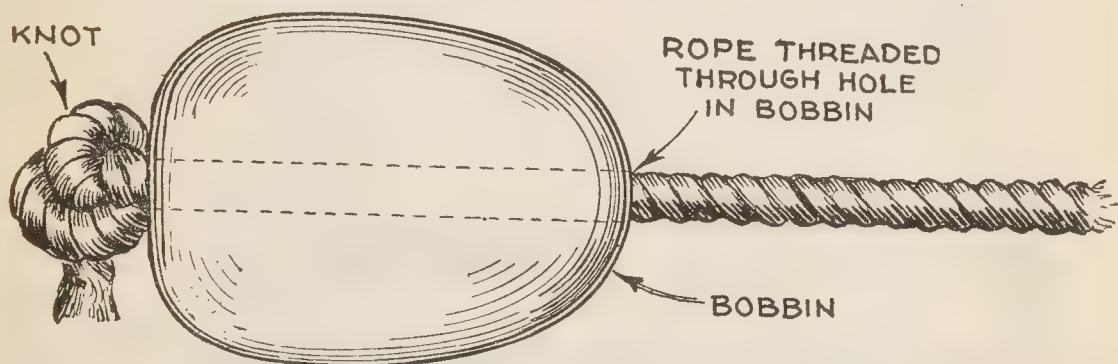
,513.—Method of attaching bobbin to rope for pulling through pipe.
